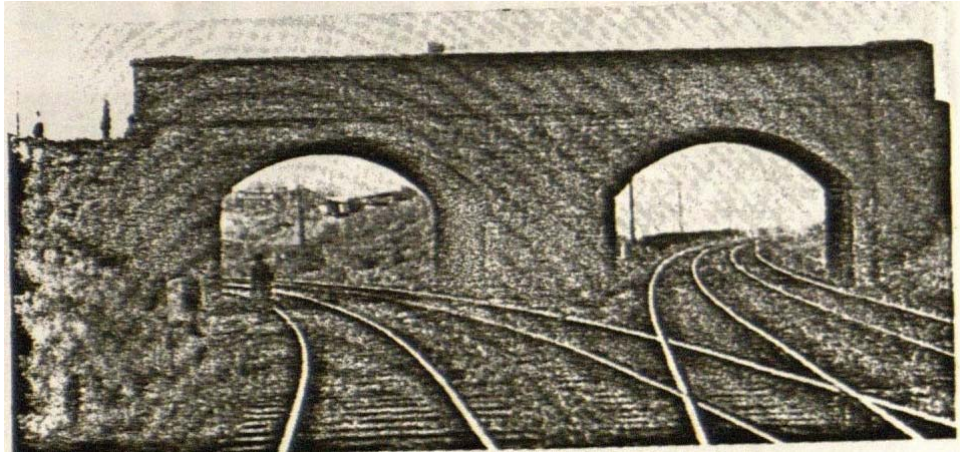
Brick Masonry arch bridge before reconstruction (Bennett 1984)
